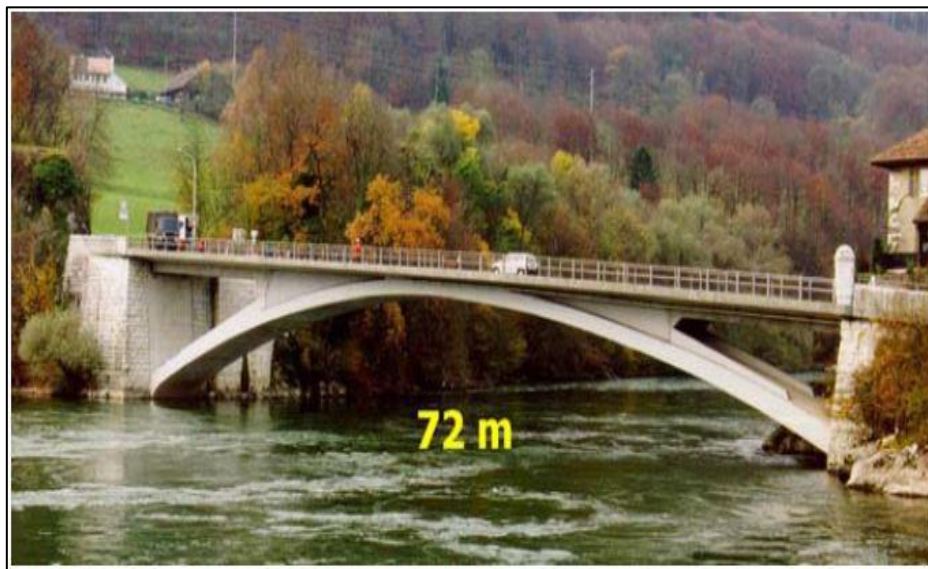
Bridge on the Aare River at Aarburg (short span bridge) [R. Cantieni. 2004].
